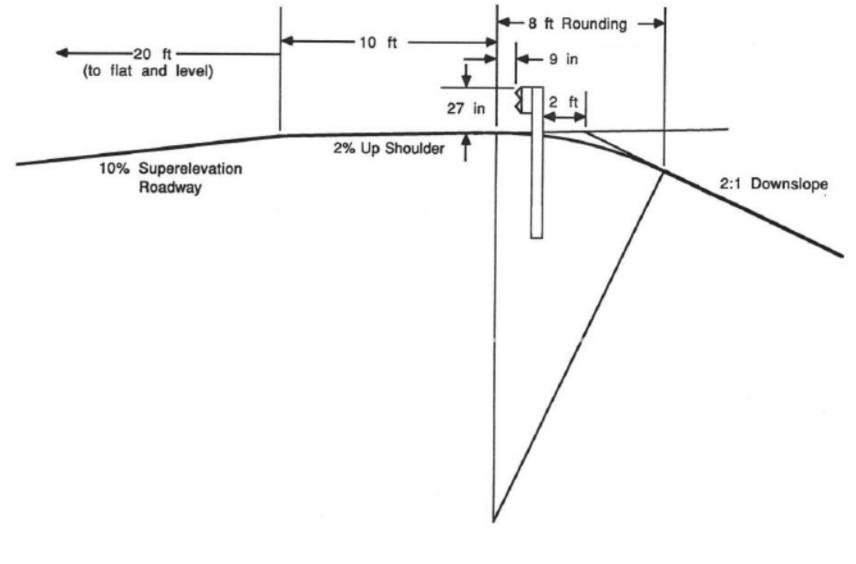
Barrier Installation, Test No. 1862-9-90 [9]
